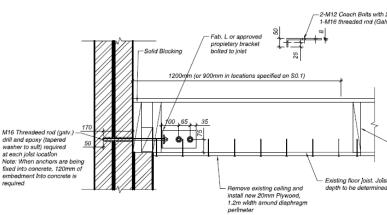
Diaphragm to Wall typical remedial detail - Joist Perpendicular
